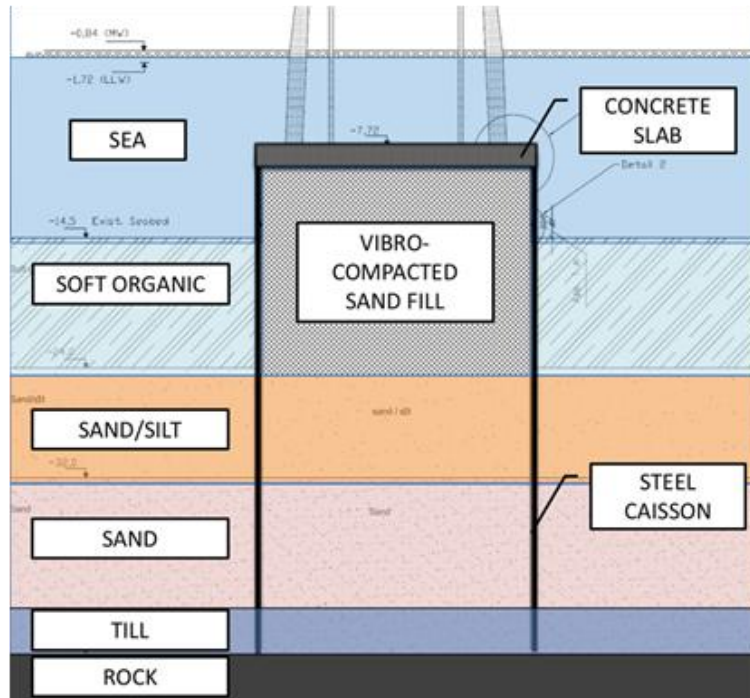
Foundation conditions of bridge pier with vibratory-compacted sand inside steel caisson.
